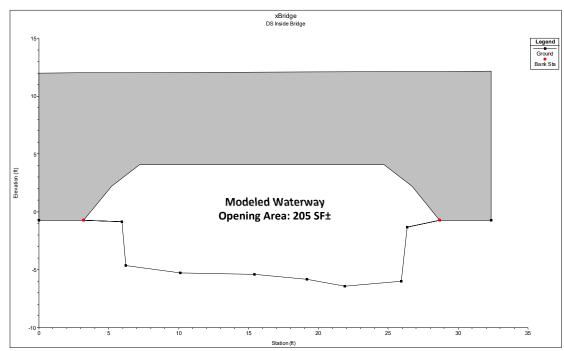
Existing bridge outlet cross-section as modeled to account for sewer main obstruction
